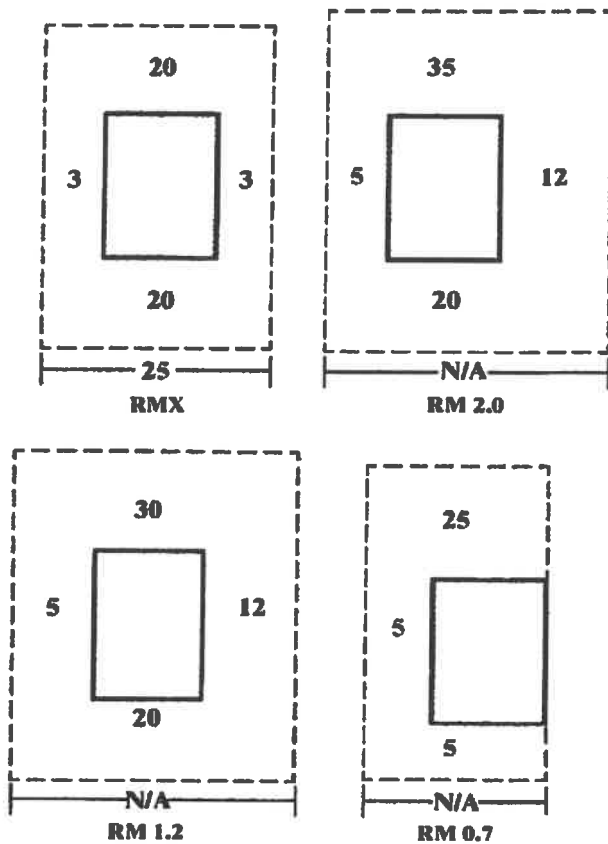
Minimum Setbacks for Multi-Family Buildings 35 ft. in Height
